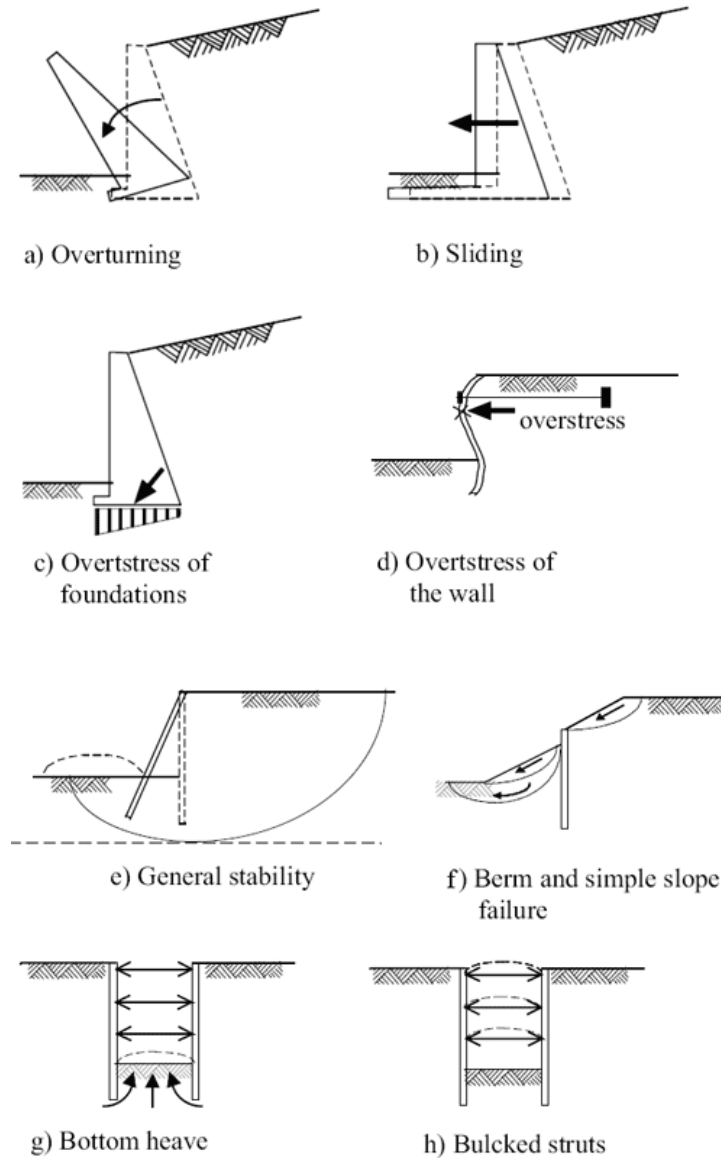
Retaining Wall Failures (The Geological Society, 2011)
